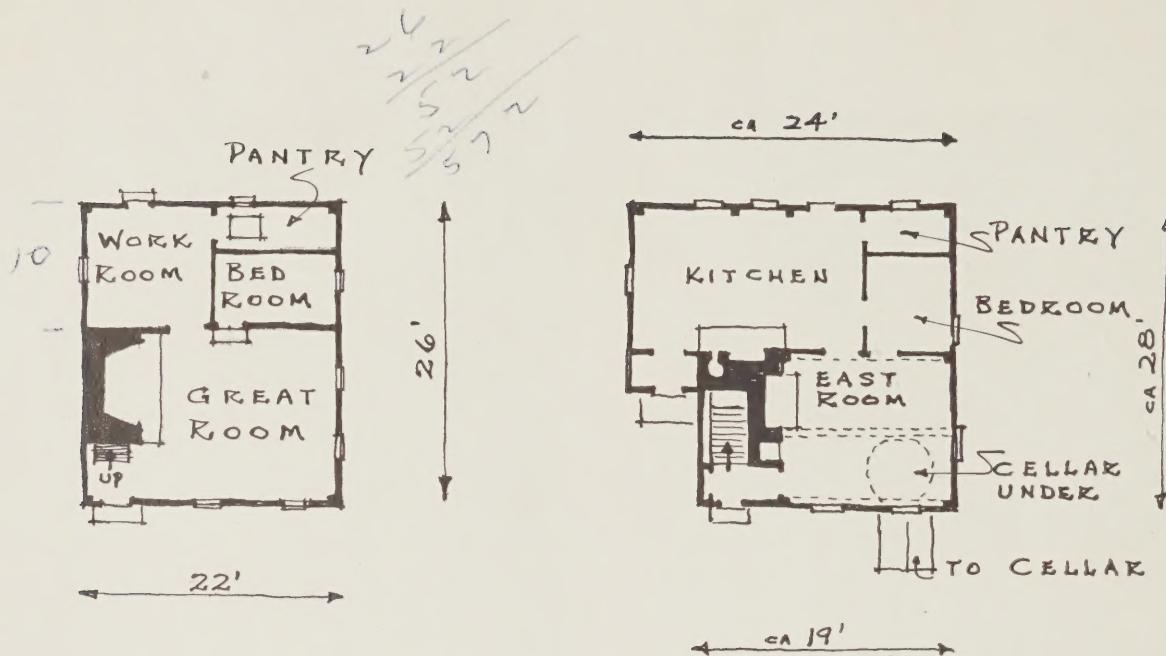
(left) Sketch plan, Hallett House, Yarmouth, seventeenth century, reconstructed from Otis, *Genealogical Notes* (author). (right) Sketch plan, Rowell House, Gull Pond Road, Wellfleet (author). The basic 'house', which could be 'doubled'.
